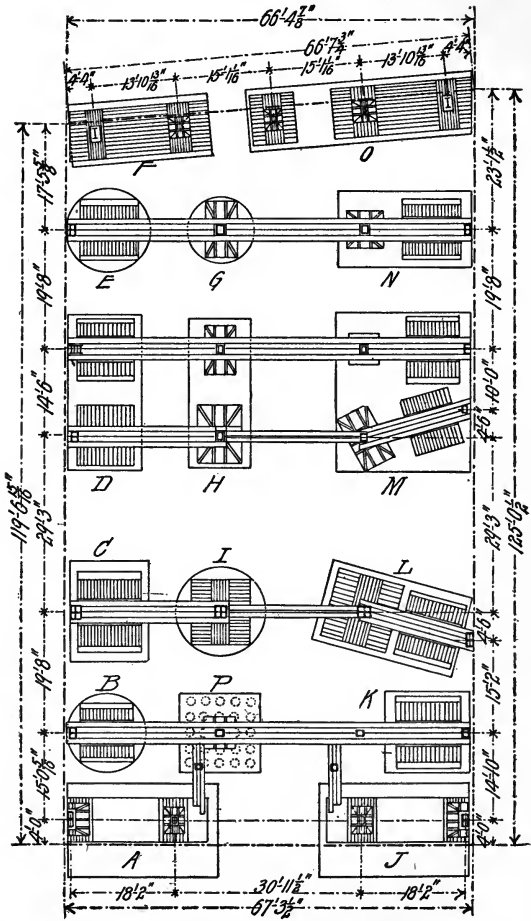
Plan of Caissons in Manhattan Life Insurance Co.'s Building, New York.
